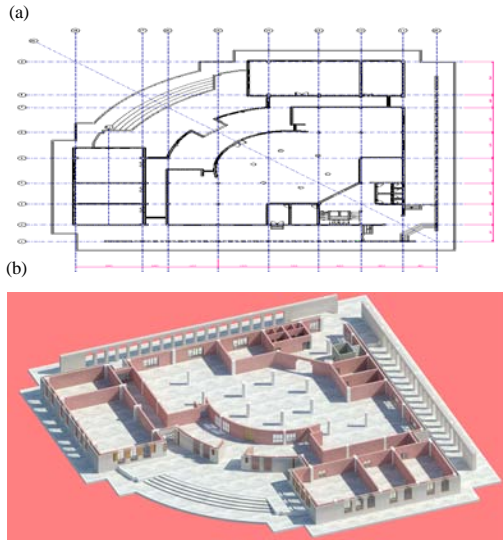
a, b) Plans (2 and 3D) of the ground floor of case study using BIM
